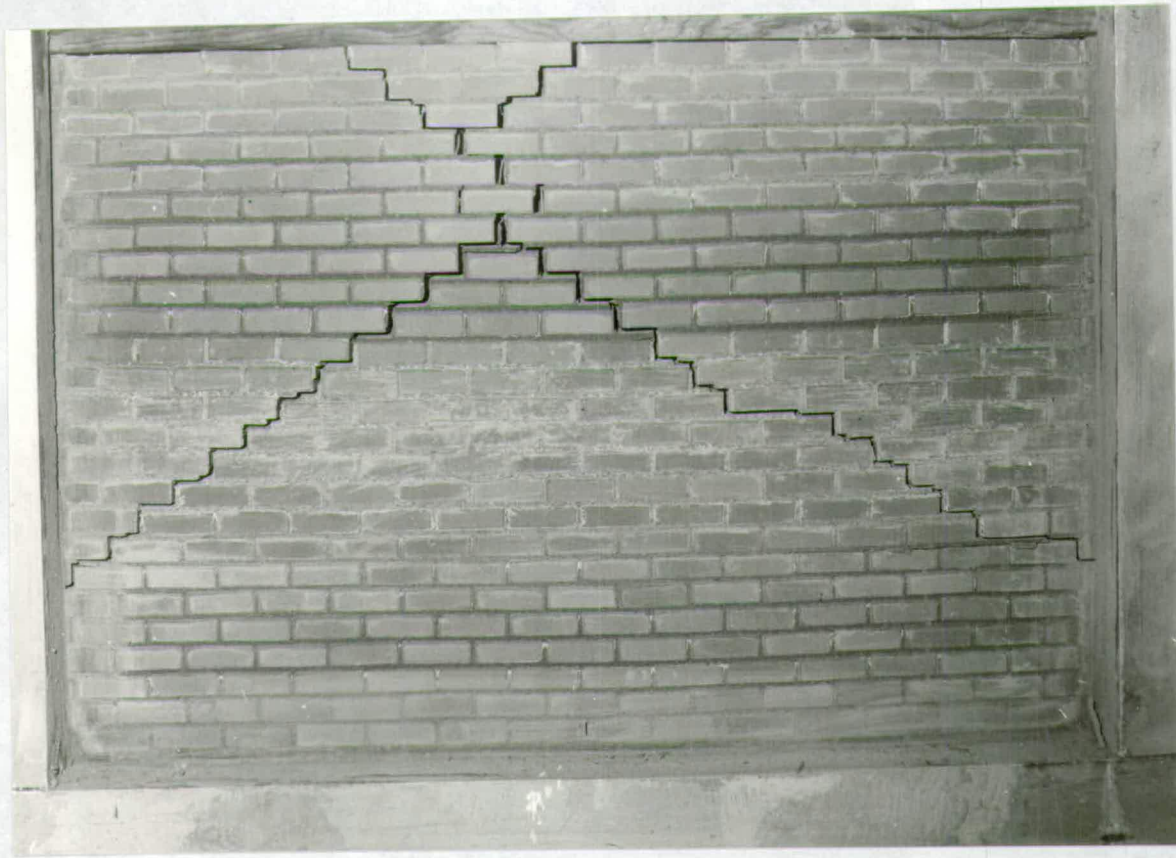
FAILURE OF WALL C3 - 3 SIDES SUPPORTED
